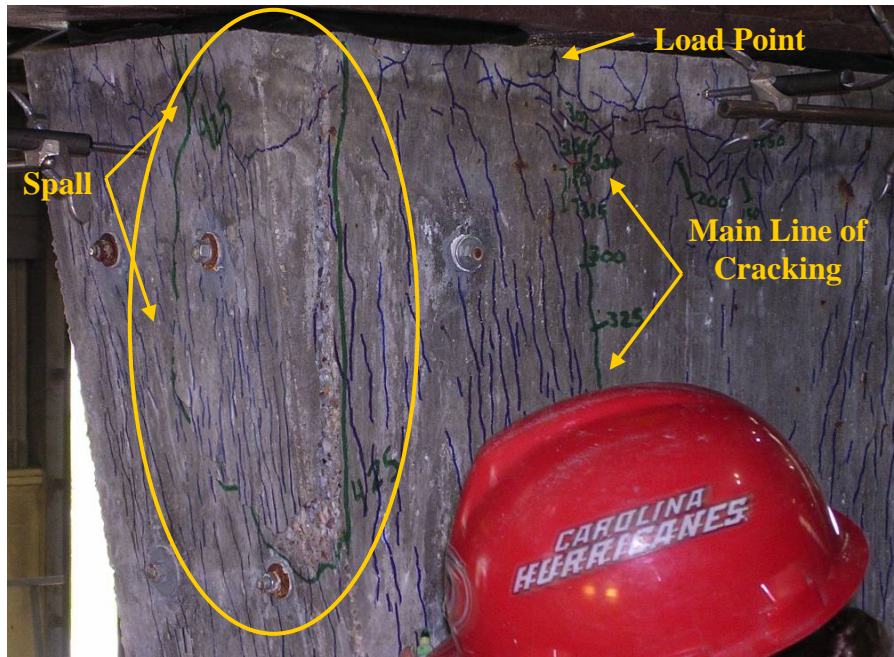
Corner Spall on Column A<sup>111</sup>
